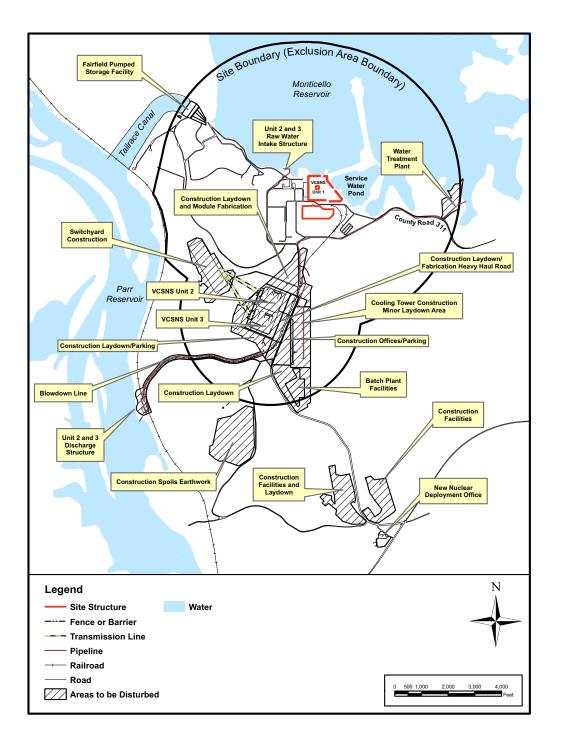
VCSNS Site and Proposed Plant Footprint
